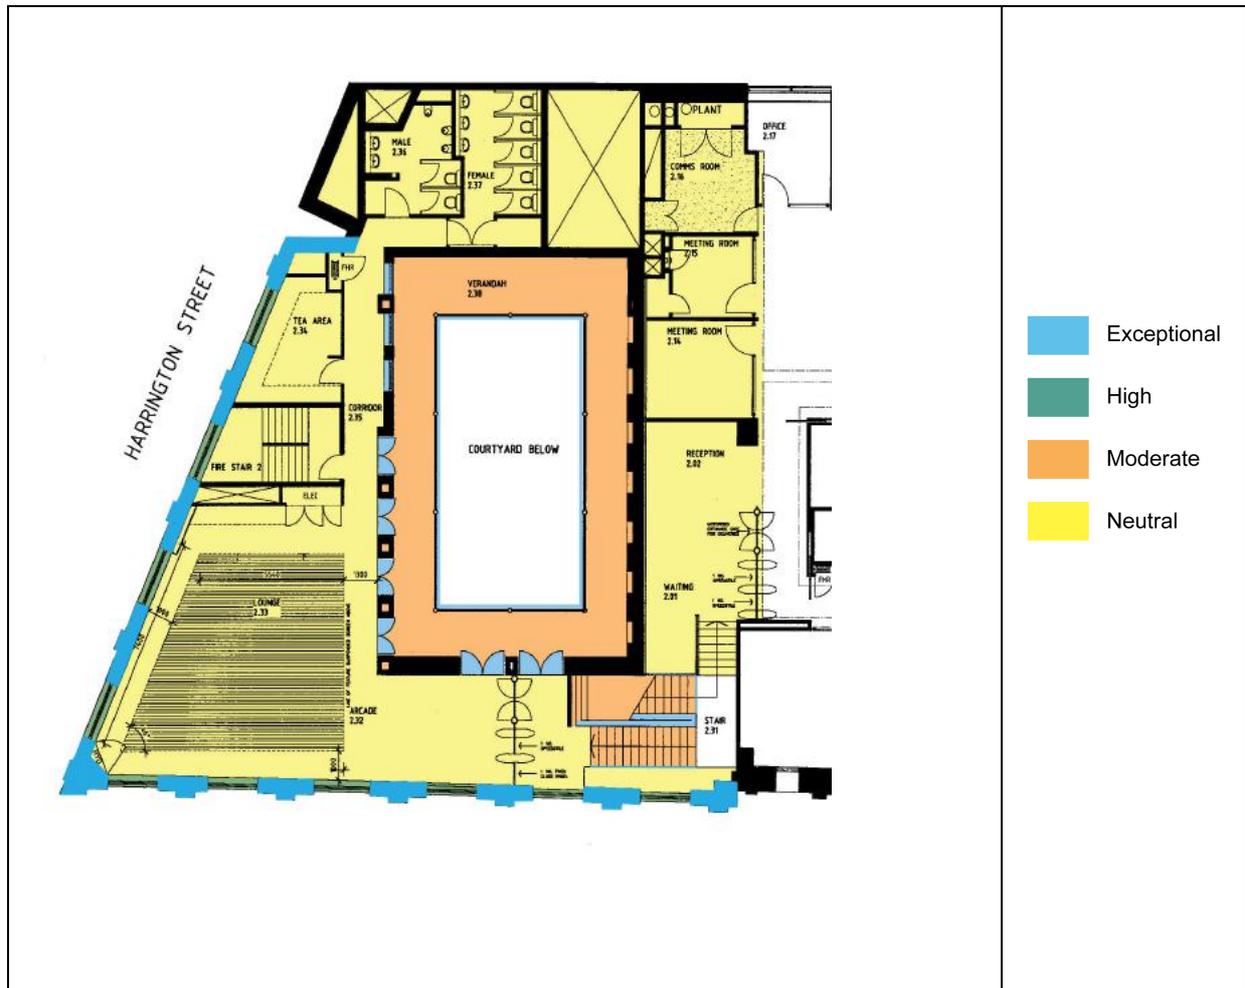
First Floor Plan showing the overall levels of significance, including the stair and the courtyard
